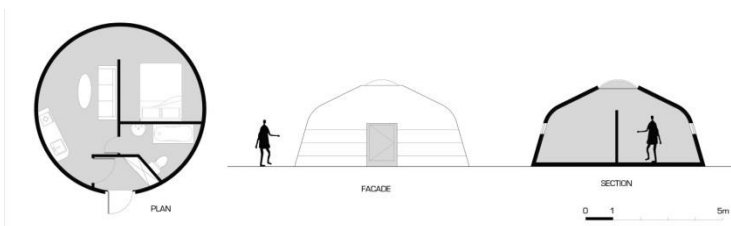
Drawing of the developed and optimized yurt with plan, façade, and section (Family yurt-1).
